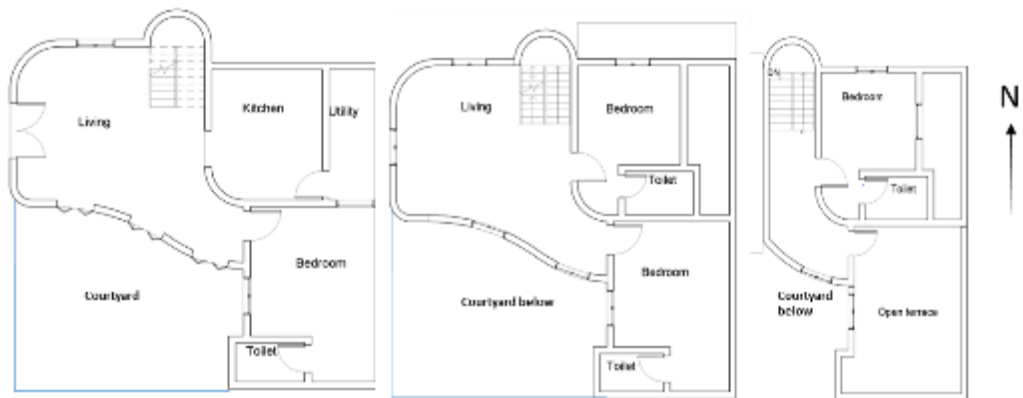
Floor plan of house 3. Ground floor (left), first floor (center), second floor (right).
